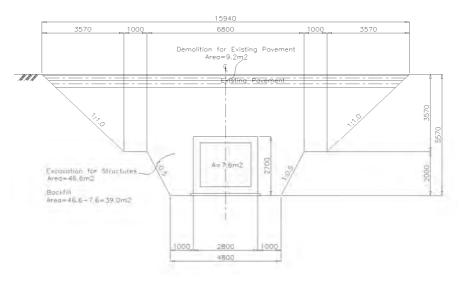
Typical Cross Section of Excavation for Box Culvert
